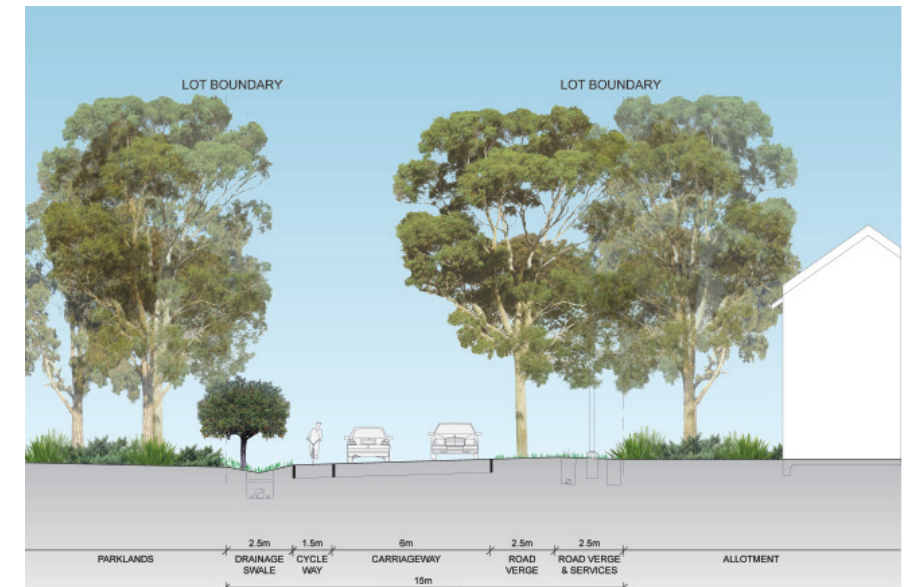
Section B-B through Hale Street with Cycleway.
